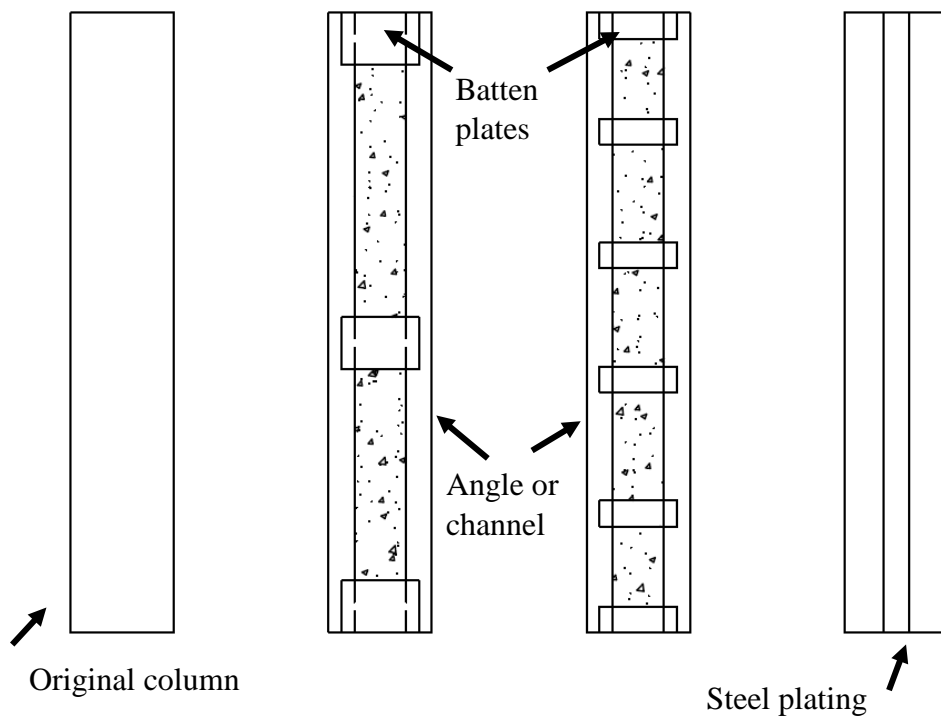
Original column; steel cage with 3 batten; steel cage with 6 batten; steel plating
